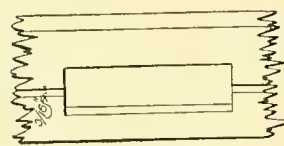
Part Side Elevation of Ridge-pole, showing Mortise.
